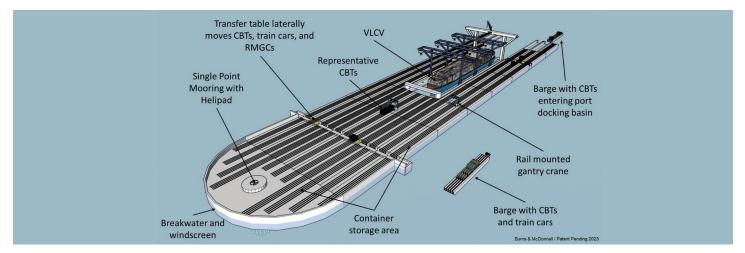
Concept Ocean FASST pivoting about a single point mooring tower.
